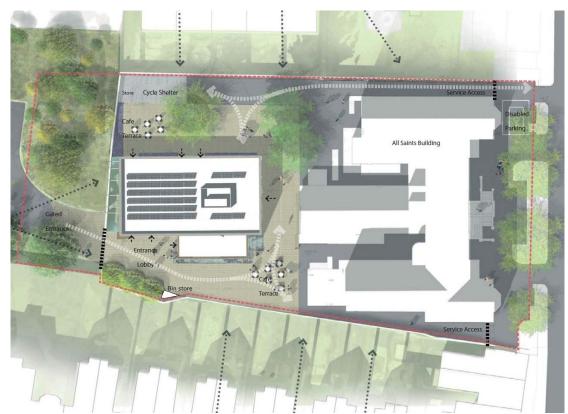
Illustrative site layout, showing the relationship of the proposed building to the existing All Saints Annexe.
